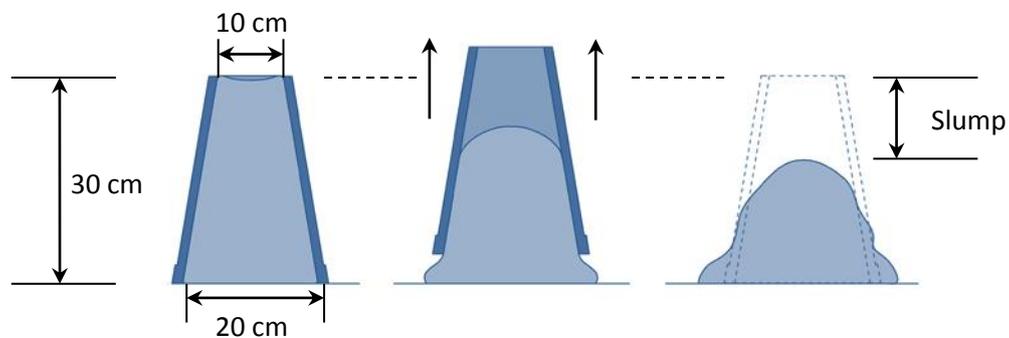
| Determination of hydraulic-cement concrete (fresh) slump value (ASTM C143)
